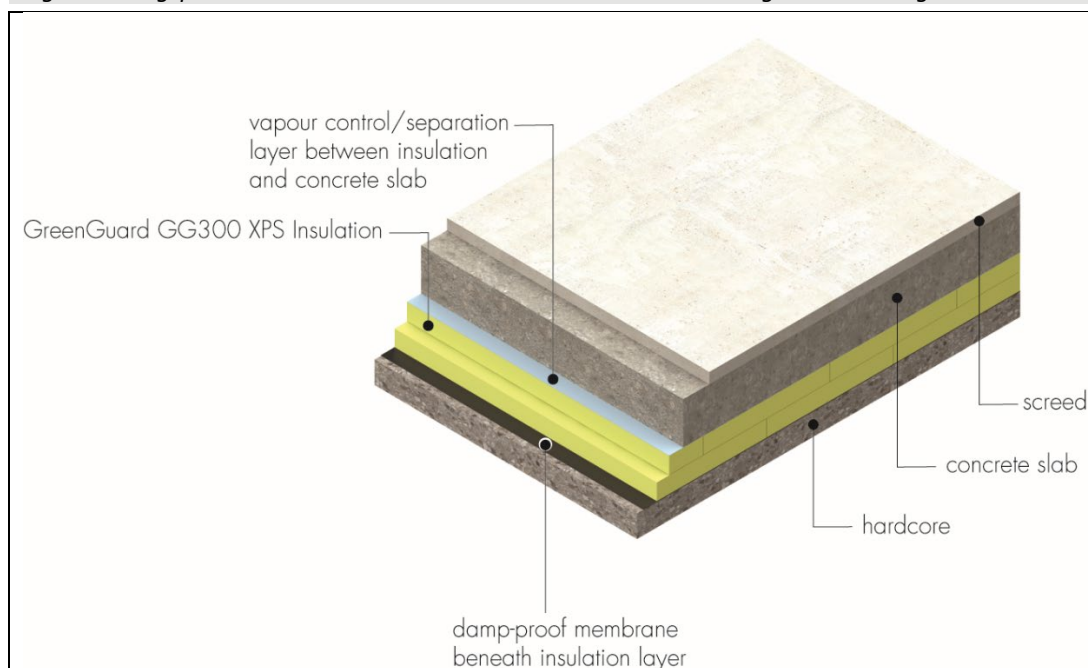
Kingspan GreenGuard GG300 XPS Floor Insulation beneath ground-bearing concrete slab
